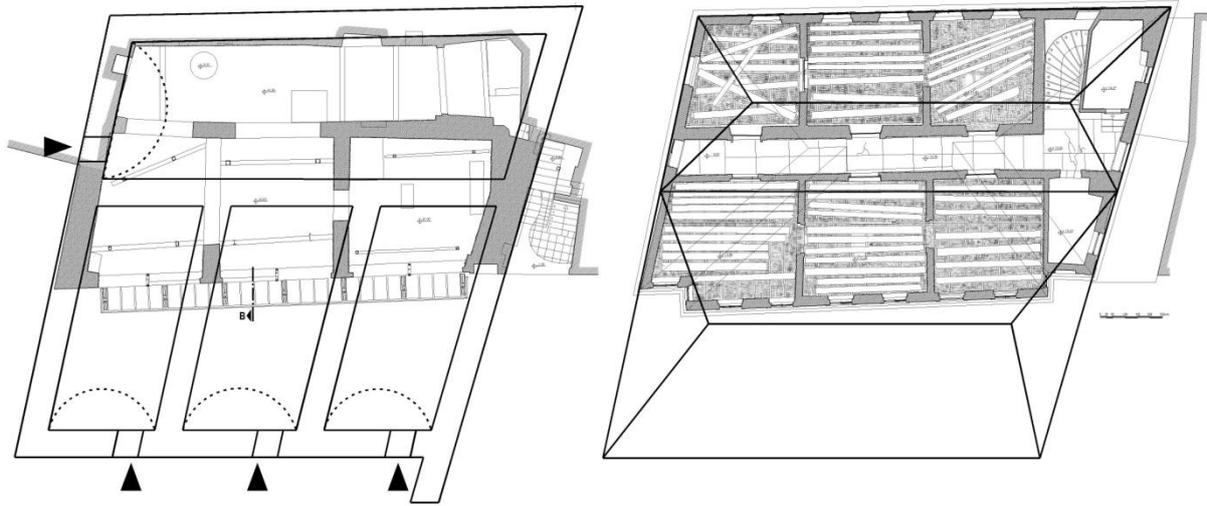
Sketches for *Palazzo Comunale* before the demolition with respect to available traces; basement floor and roof structure (Author, 2017)
